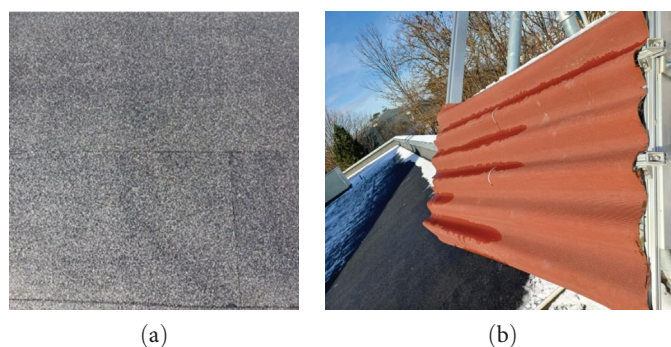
Experimental rooftop flooring: (a) tar paper roof sheet applied on the rooftop floor of the test building and (b) cellulose fiber roof board placed in a latitude-tilt position on a dual-axis solar tracker.
